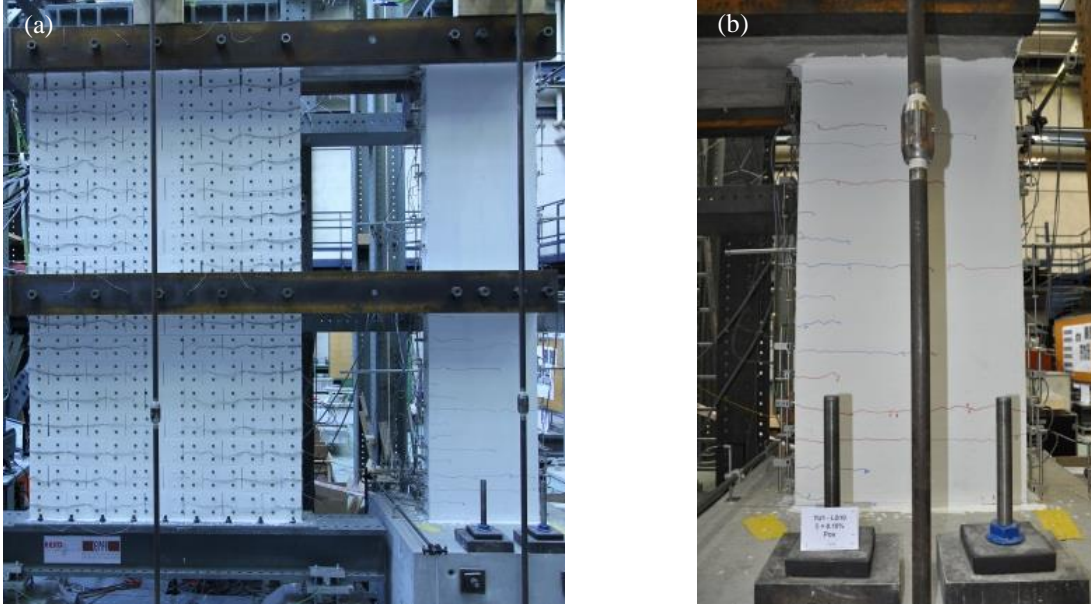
Crack pattern at LS10, $\delta = +0.1\%$. (a) specimen; (b) RC wall, first storey.
